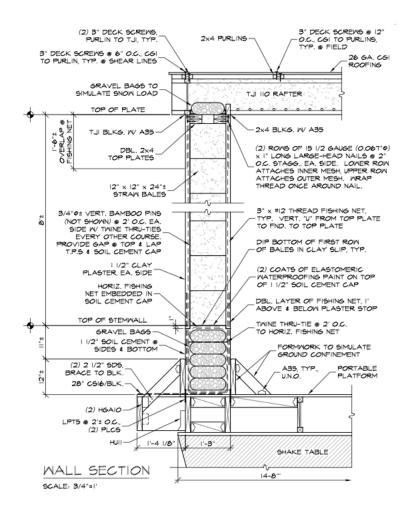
PAKSBAB house wall section (shake table assembly) (drawing - D.Donovan)
